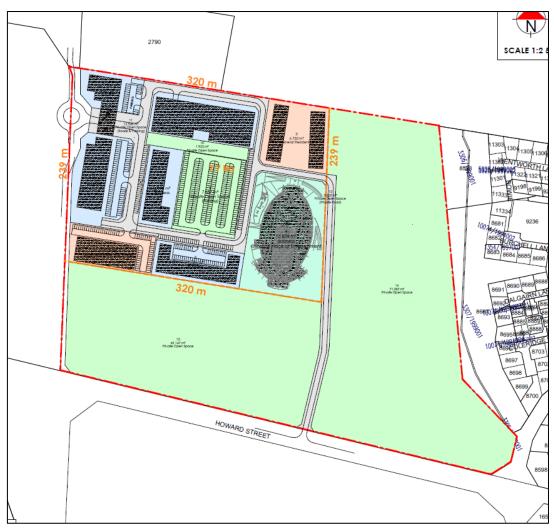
EXTRACT OF ALTERNATIVE 1 SITE DEVELOPMENT PLAN
